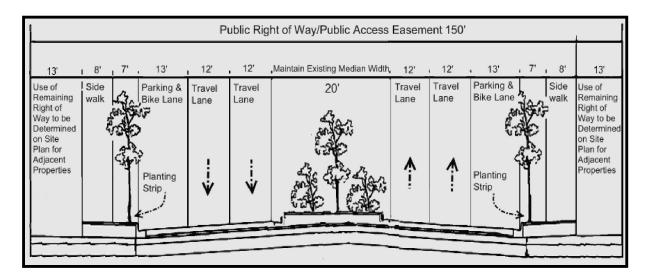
12th Street Cross Section 250 Feet North of the Railroad Spur Located Between Aspen and Haines to I-40
